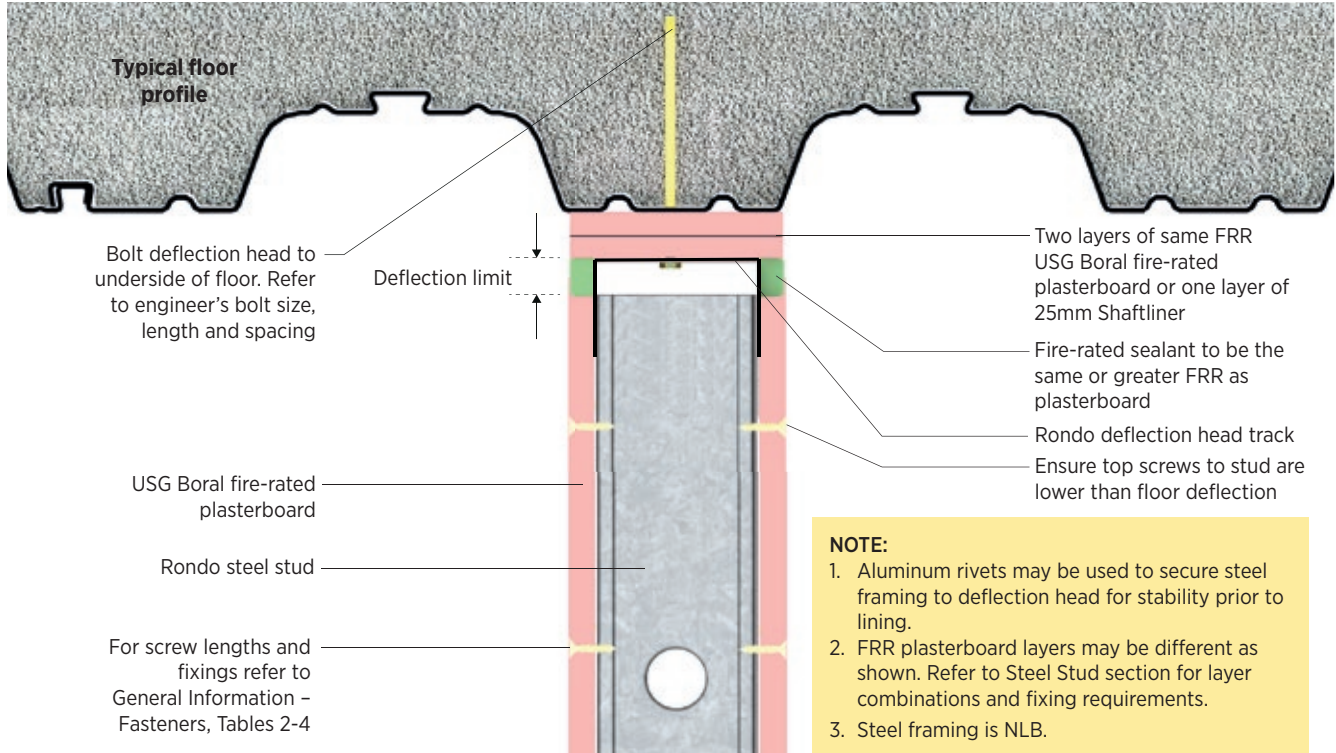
Steel Stud Wall Parallel to Rib Profile - Directly Under Rib
